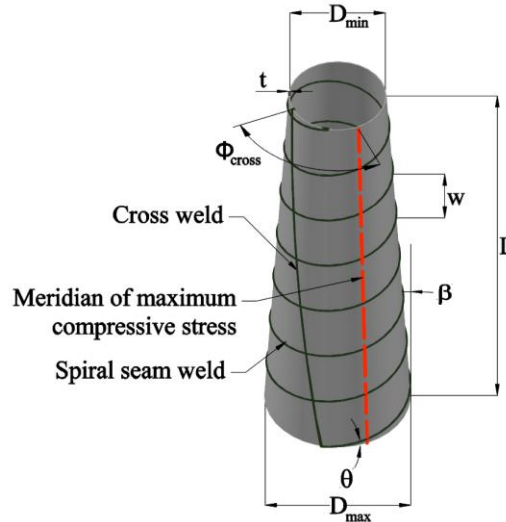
Schematic of spirally welded tapered tube.
